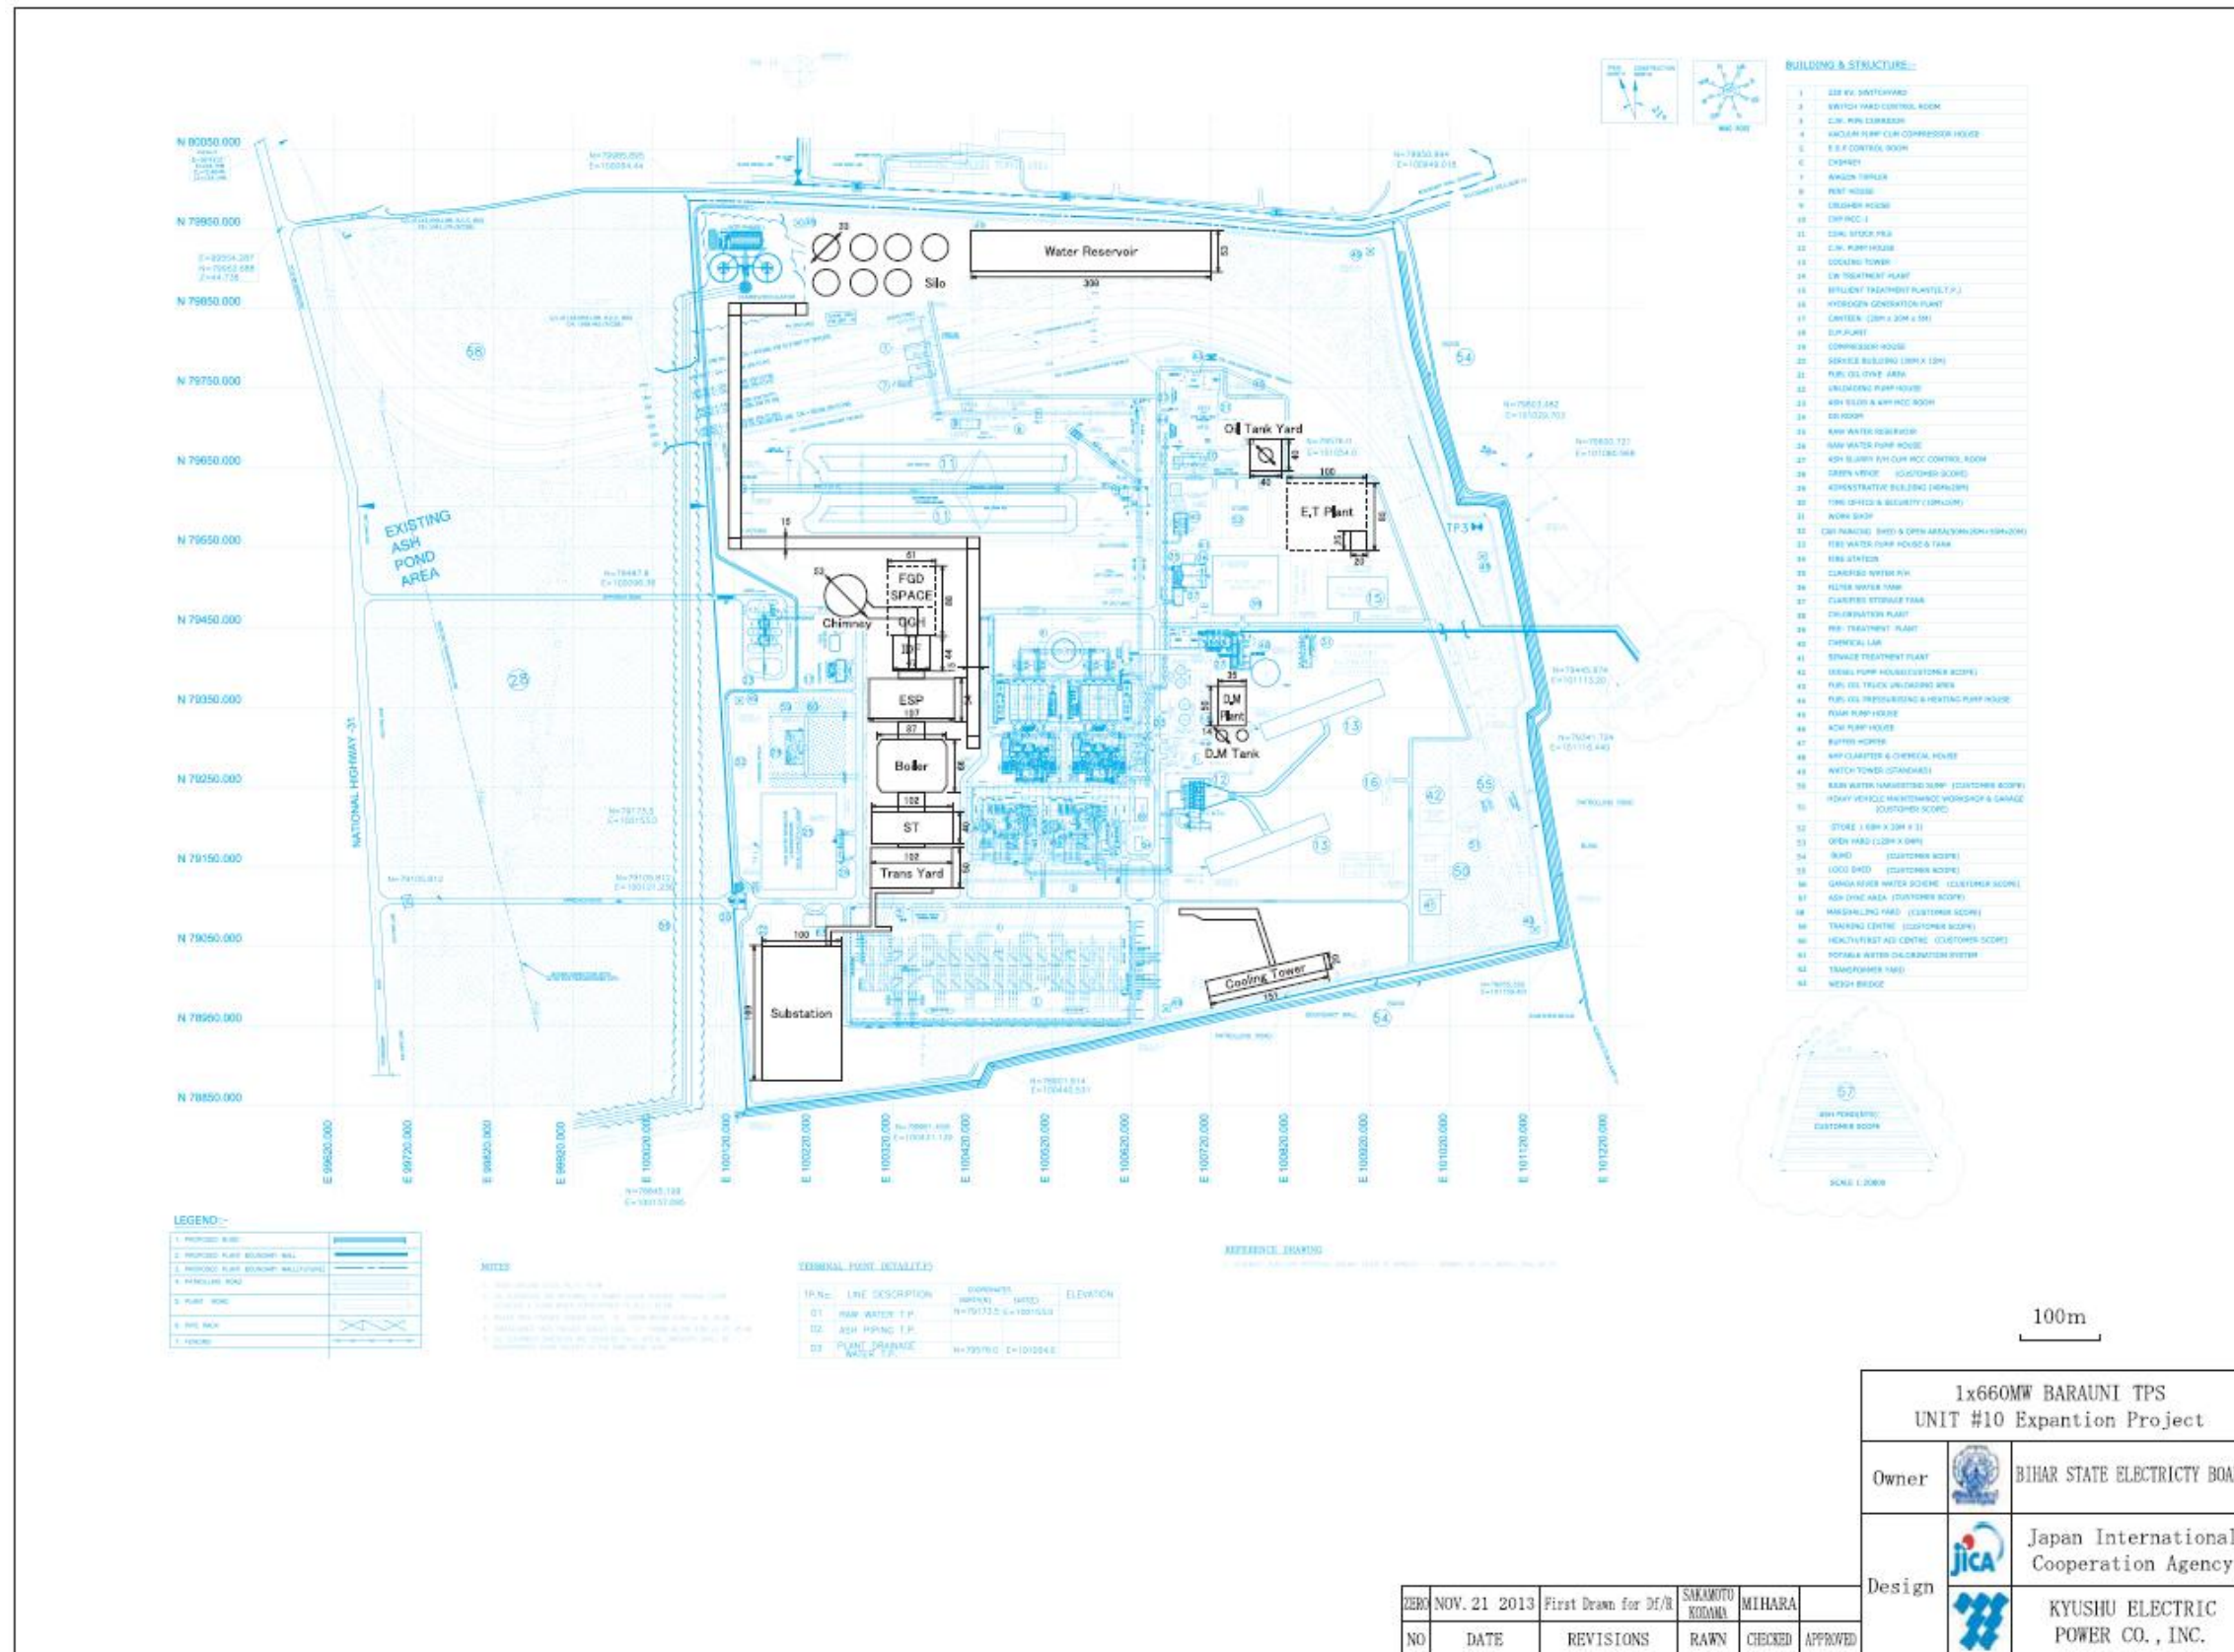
Configuration Adopted in India in Planned Site of Unit No.10 (CONSTRUCTION POSSIBLE)
